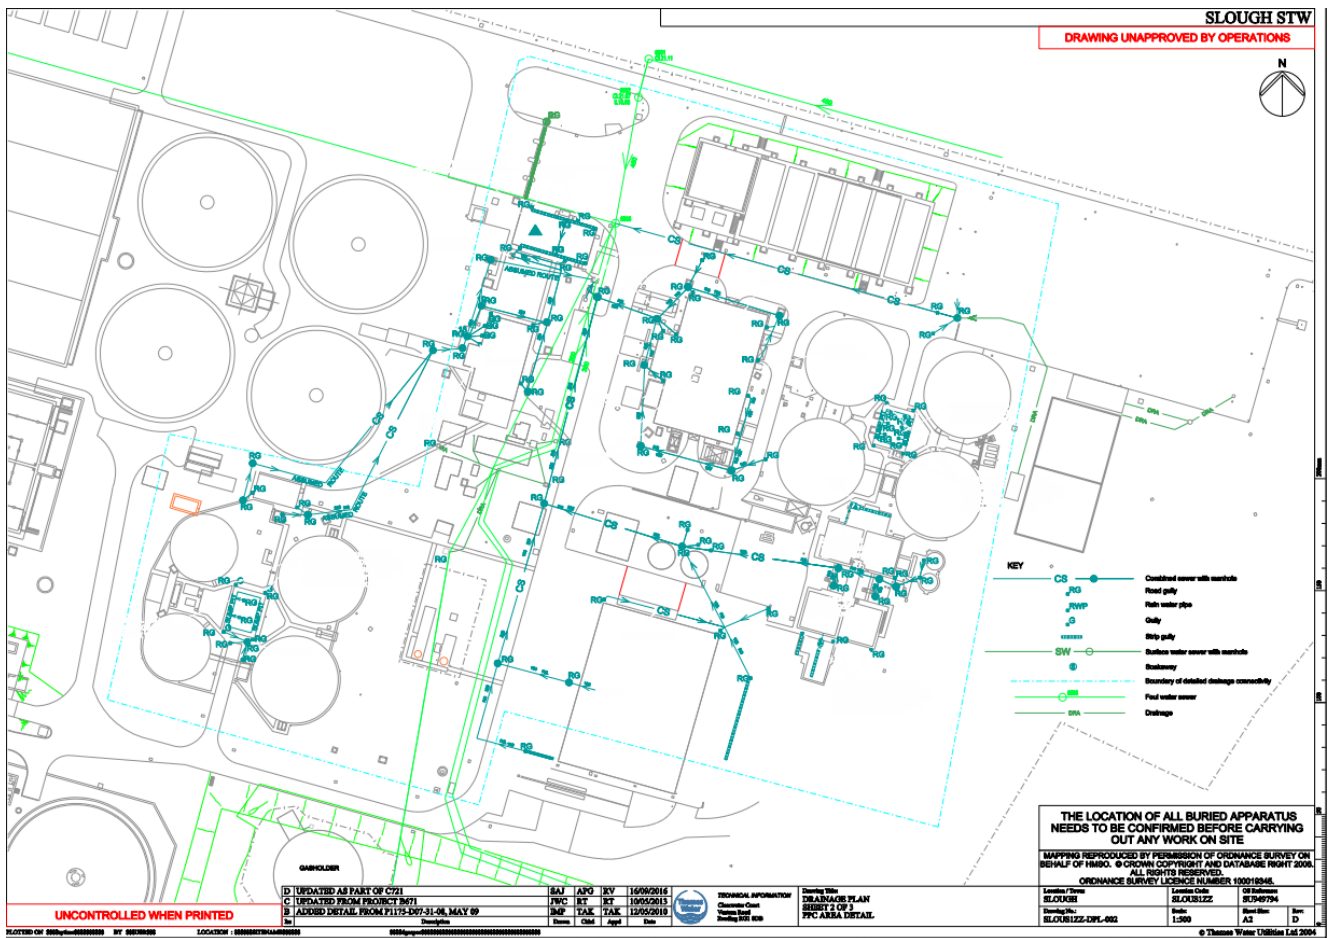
PPC Area – Drainage Plan sheet 2 – Primary Digesters area
